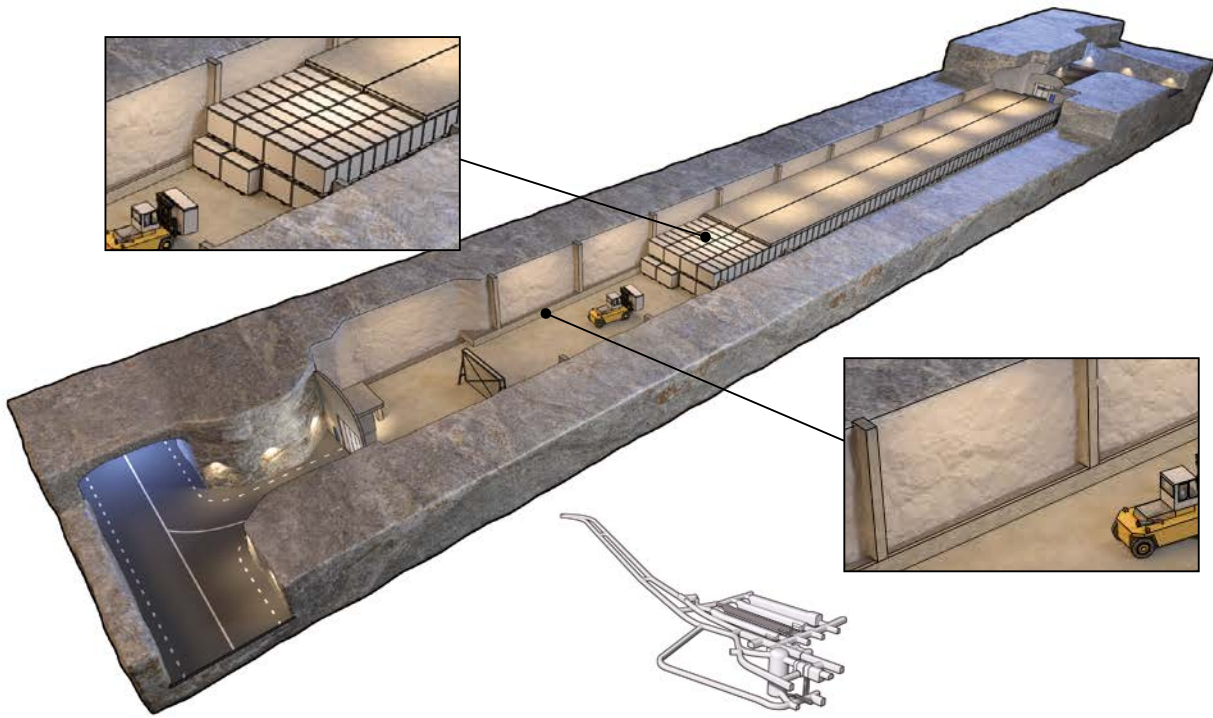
Illustration of 2BTF during the operating phase. The upper detail shows the emplacement of concrete tanks, the lower detail shows the skirting and concrete pillars in addition there is a view of SFR 1 with the position of 2BTF highlighted.
